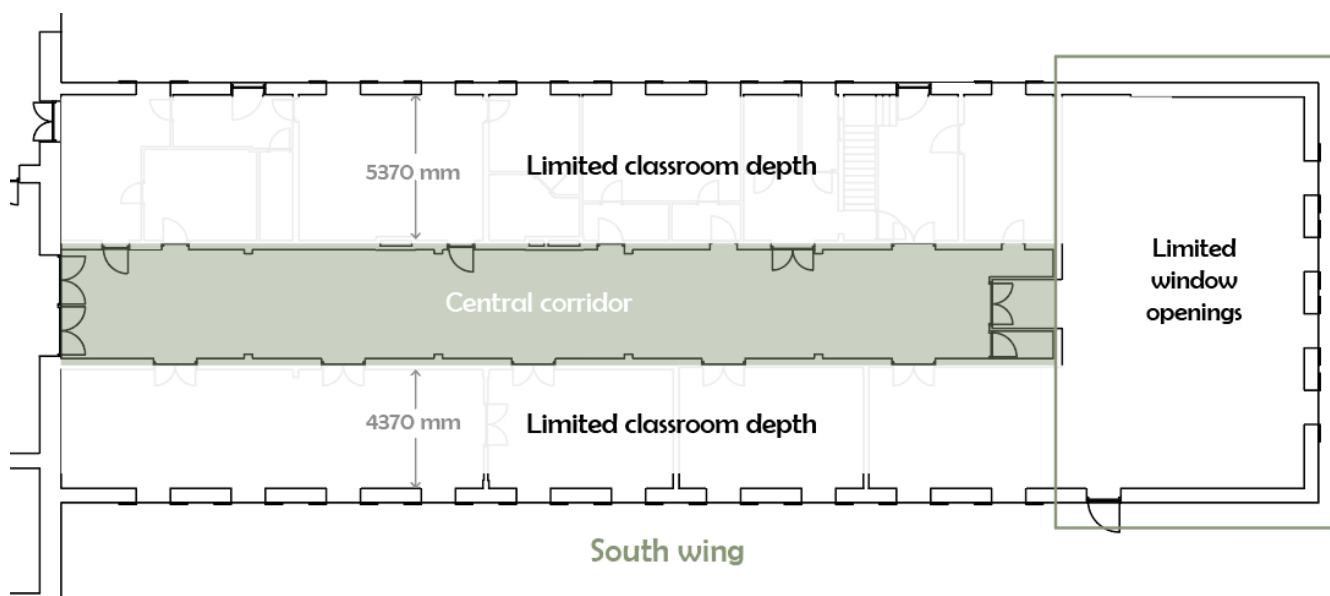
Floorplan of the south wing showing the central corridor structure, limited classroom depth, and restricted daylight access
